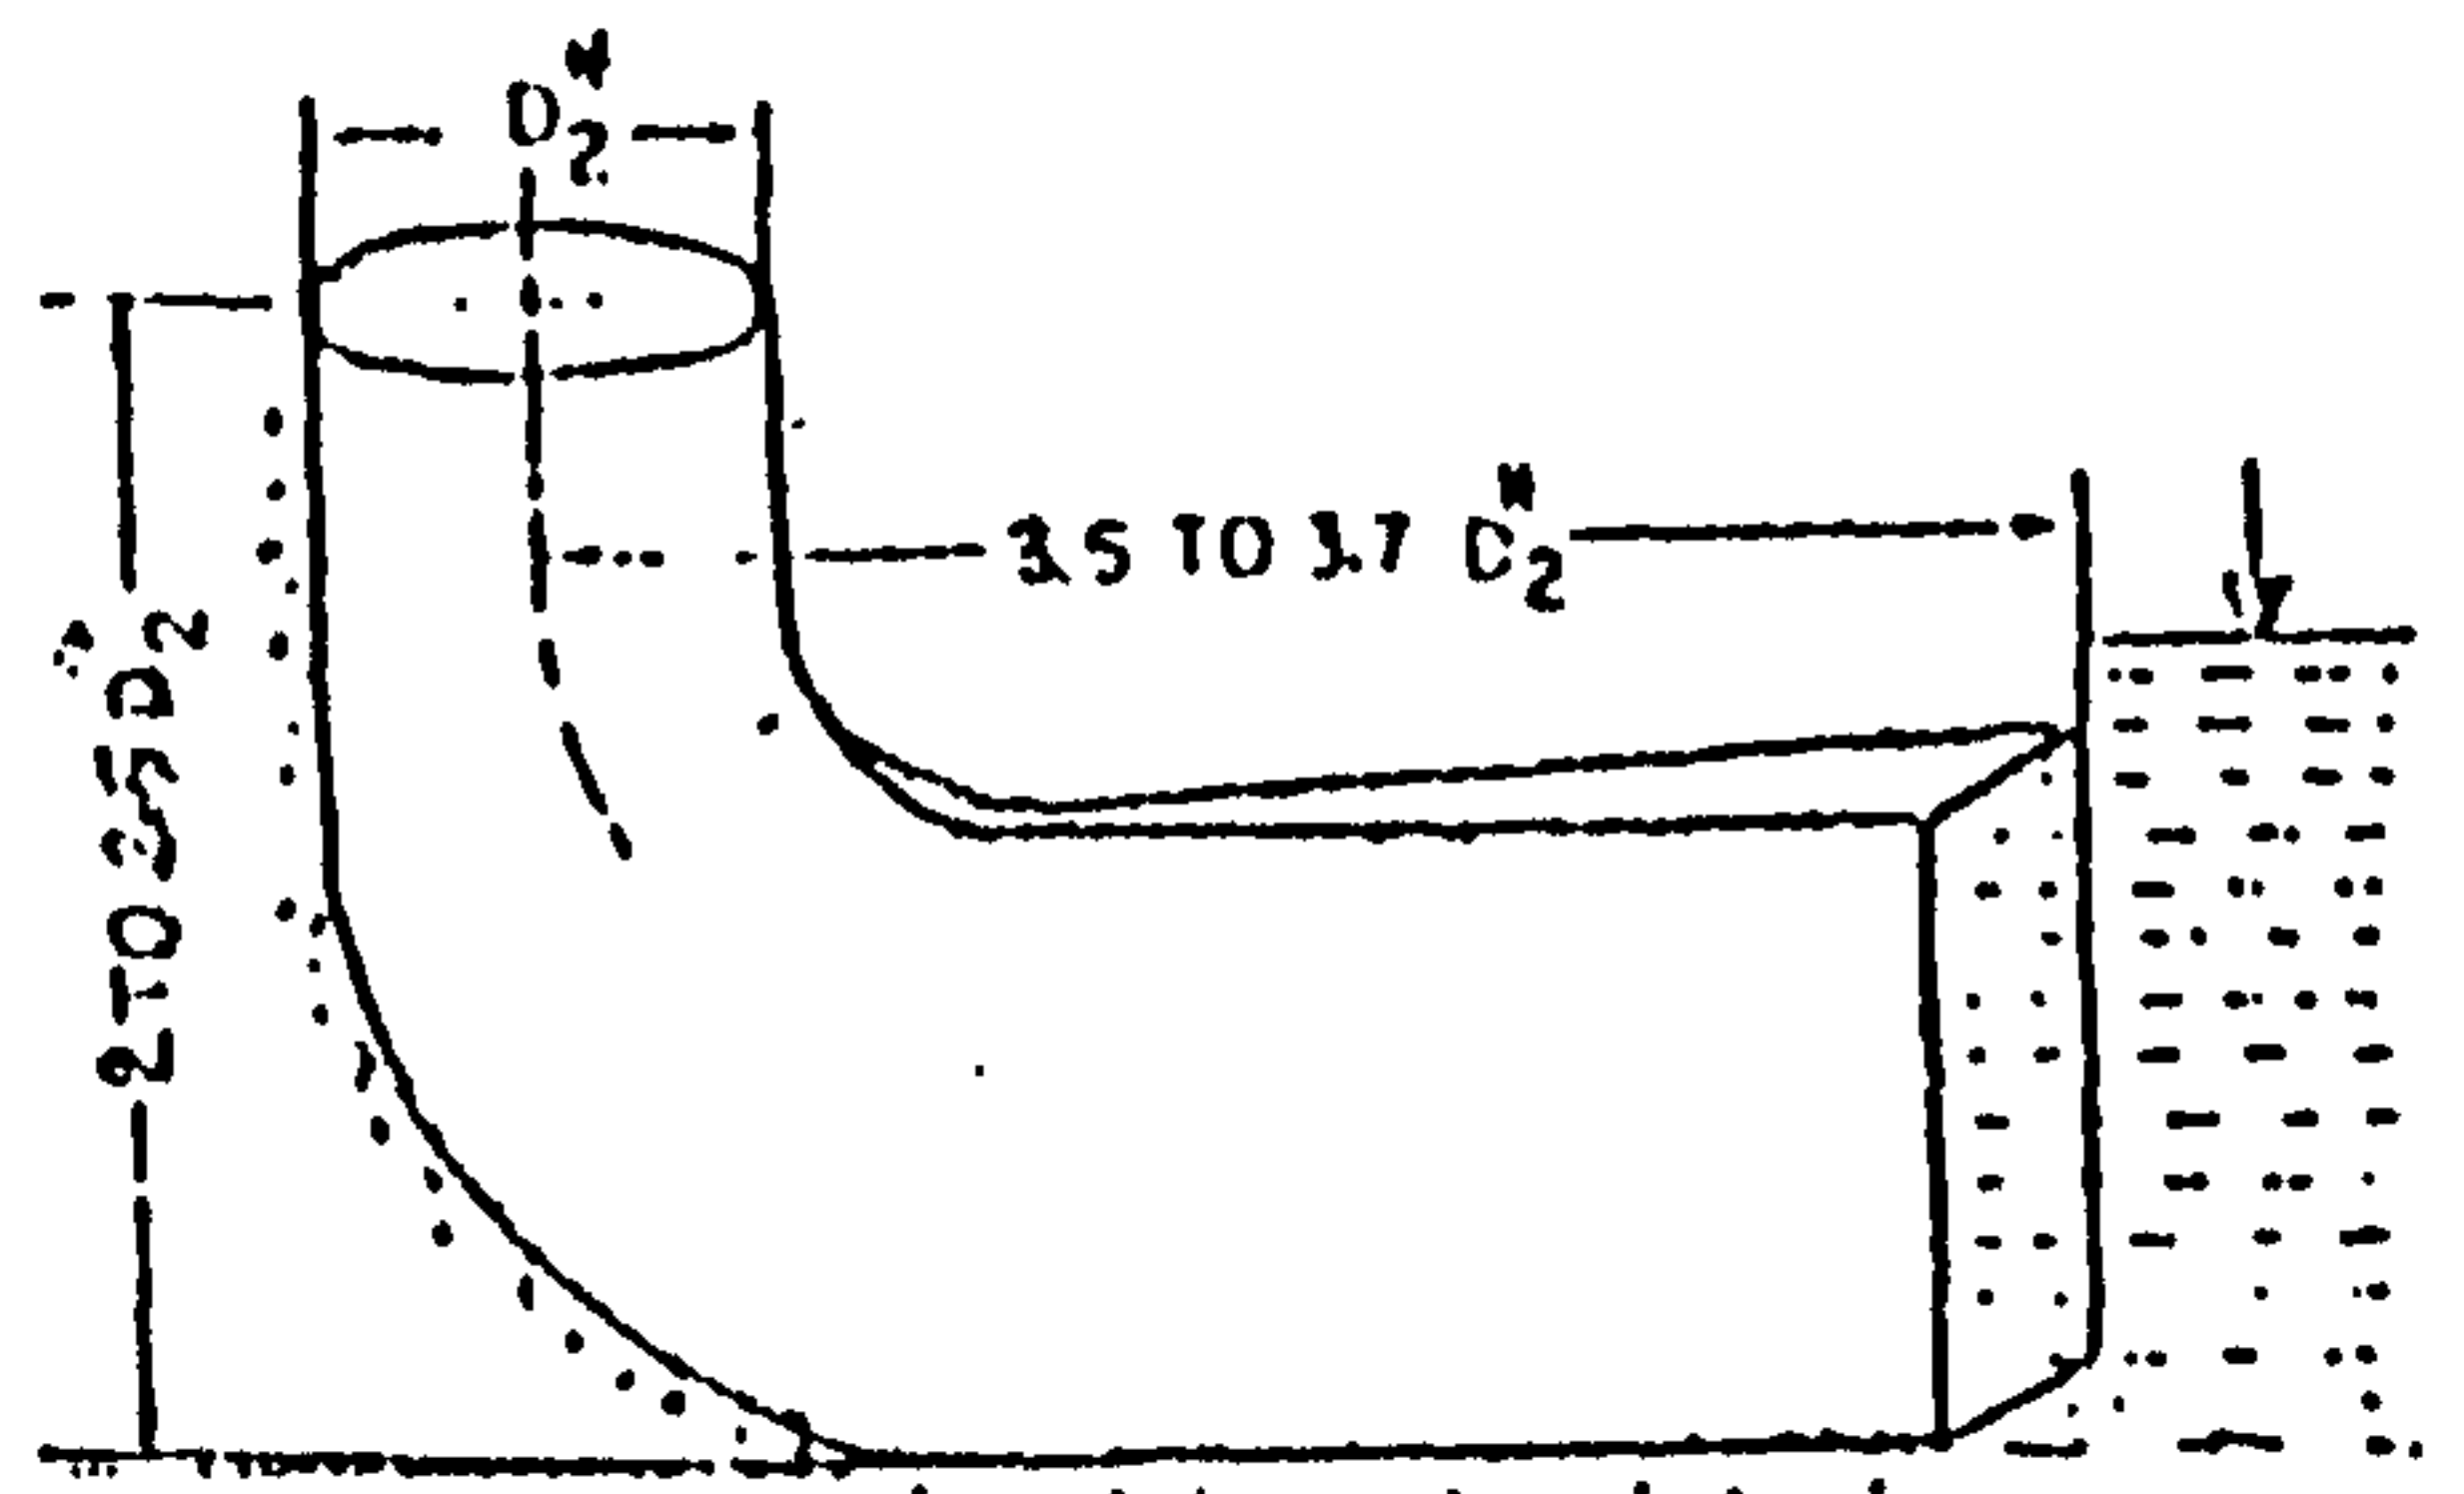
b - Elbow tube having circular cross-section at inlet but Rectangular at outlet.
